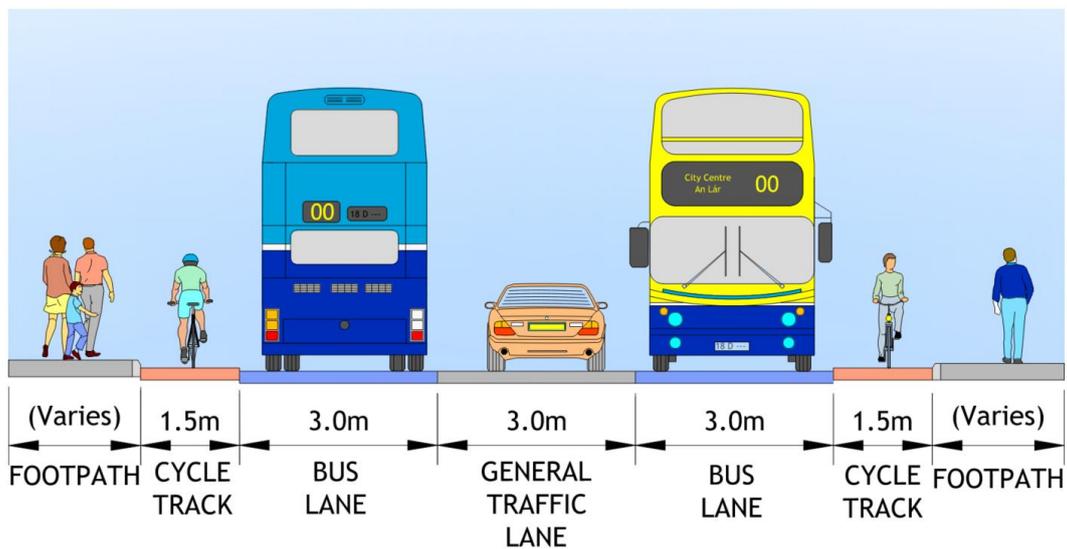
Cross-Section B-B (Relevant to RF8)
